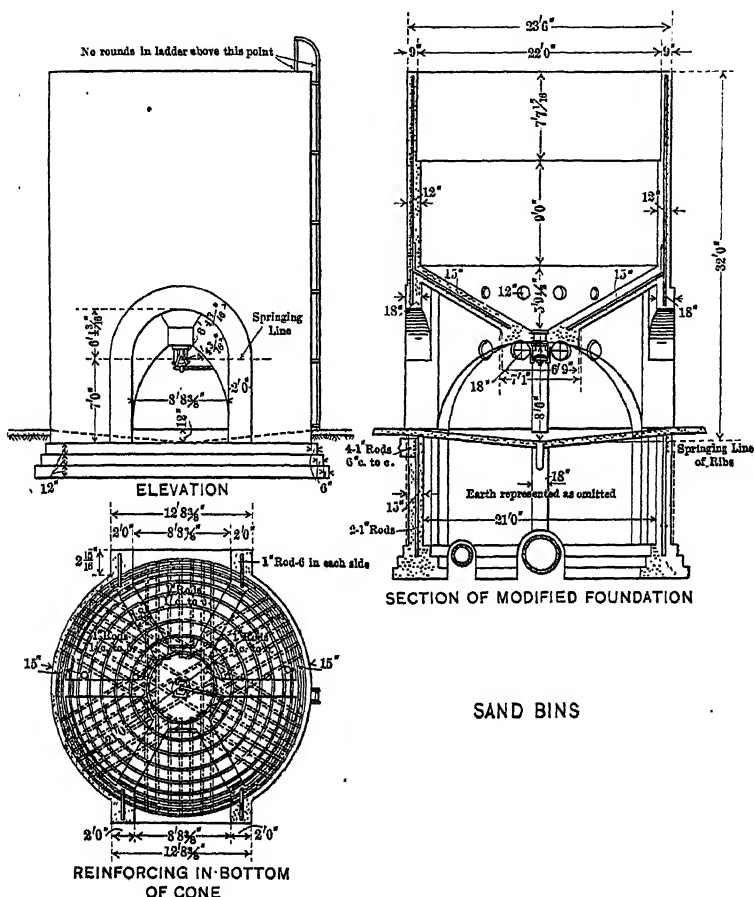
Sand Storage Bins, Washington, D. C., Filtration Plant.
